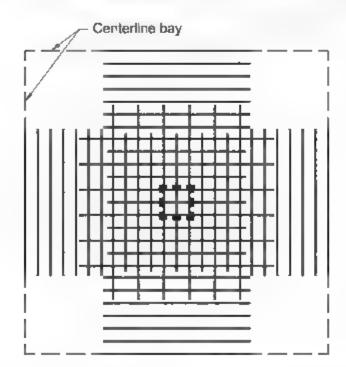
Arrangement of minimum reinforcement near the top of a two-way slab (Code Fig. R8.6.1.1).
